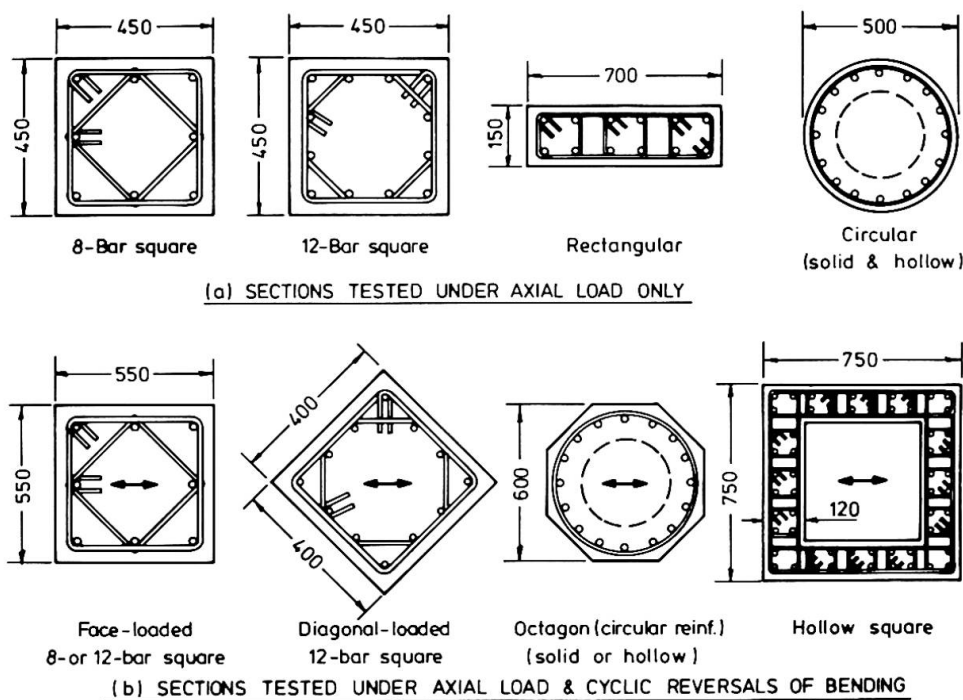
SECTIONS TESTED TO ESTABLISH DUCTILITY OF BRIDGE PIERS
